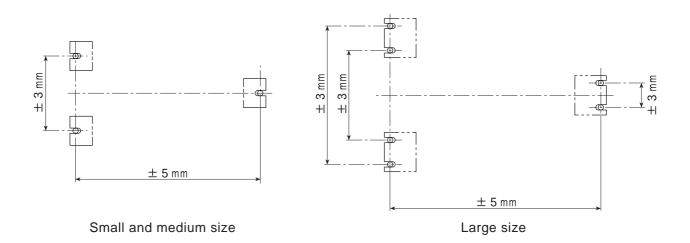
Anchor Bolt Pitch and Tolerance
